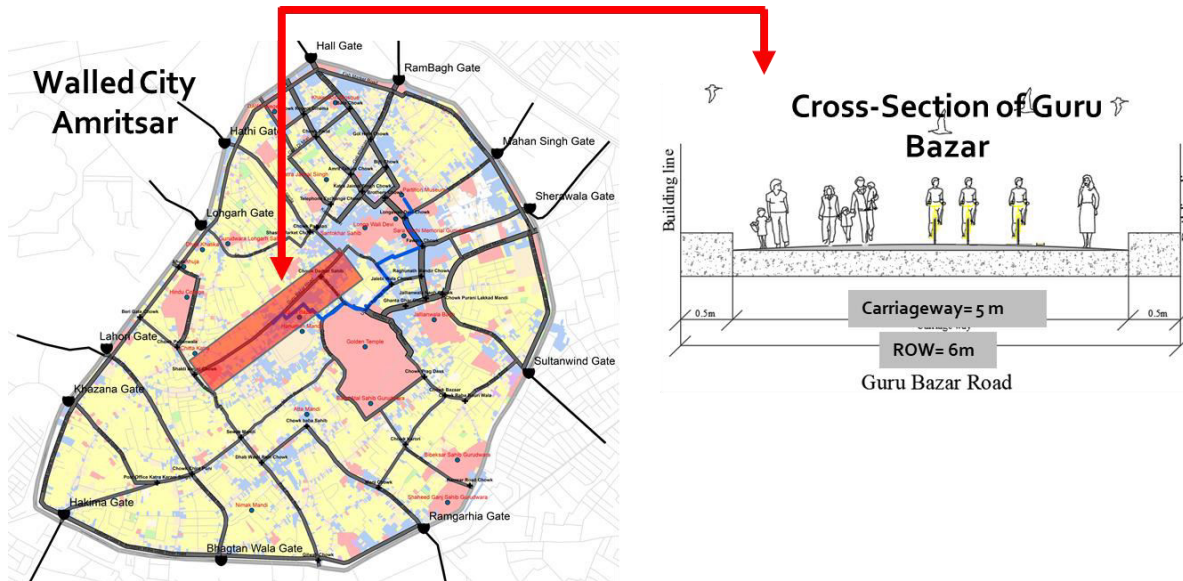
Location of Guru Bazar Road and it's Cross-section
